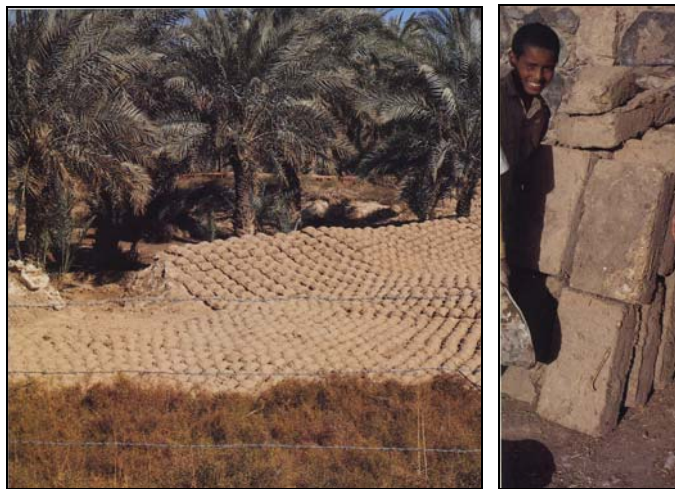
Adobe Blocks. Adobe blocks were dried in the sun before use as a building material (King, 1998).
